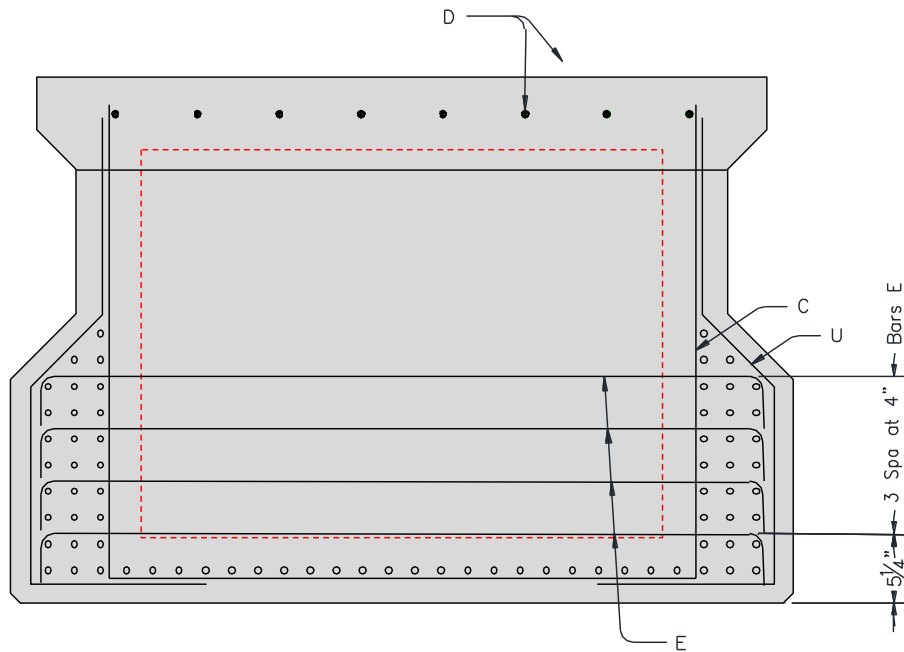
End region reinforcement used in 5B40-4. Fourth steel curtain detail is shown.
